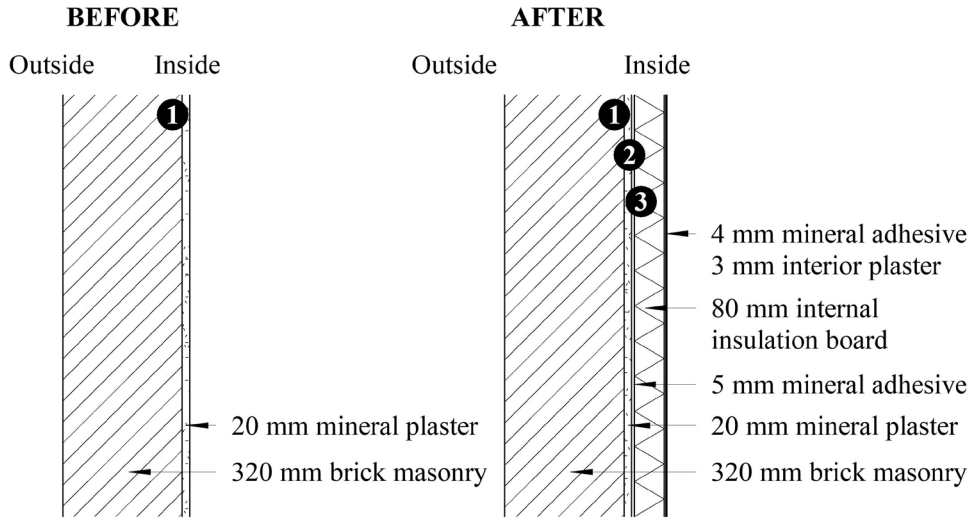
Plan section, external wall construction, initial and retrofitted state.
